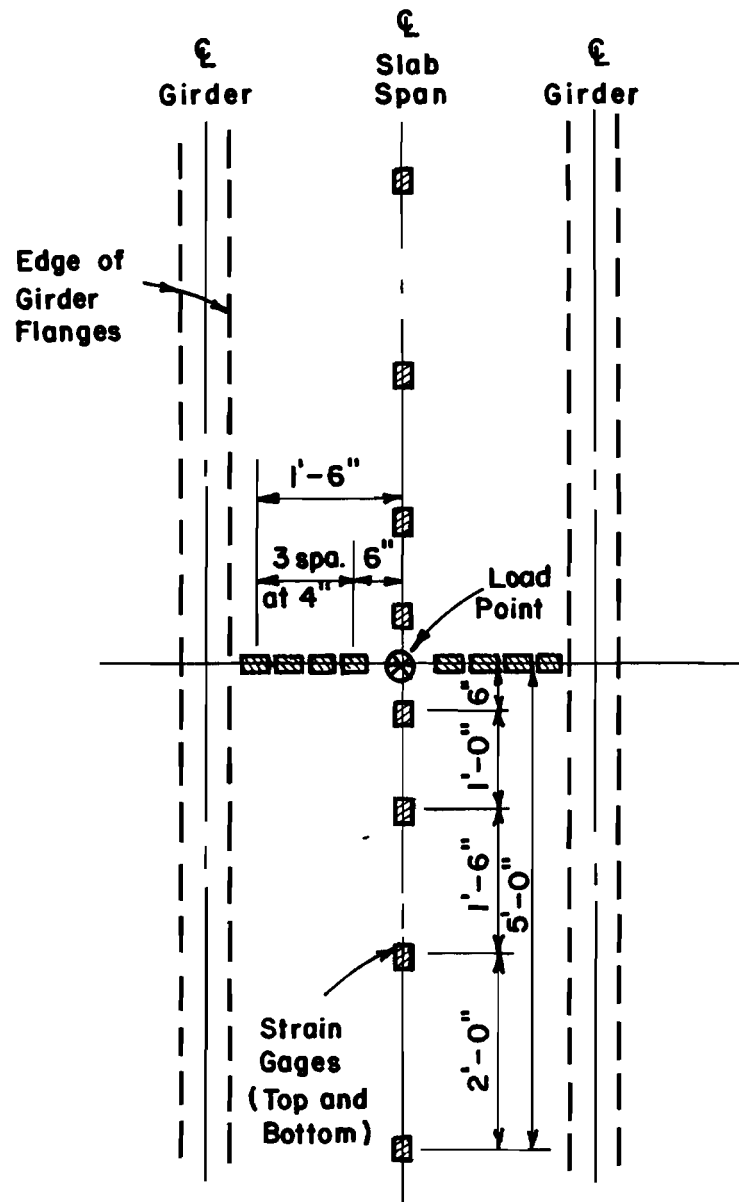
Strain gage layout for interior positive moment test on straight-draped side of bridge
